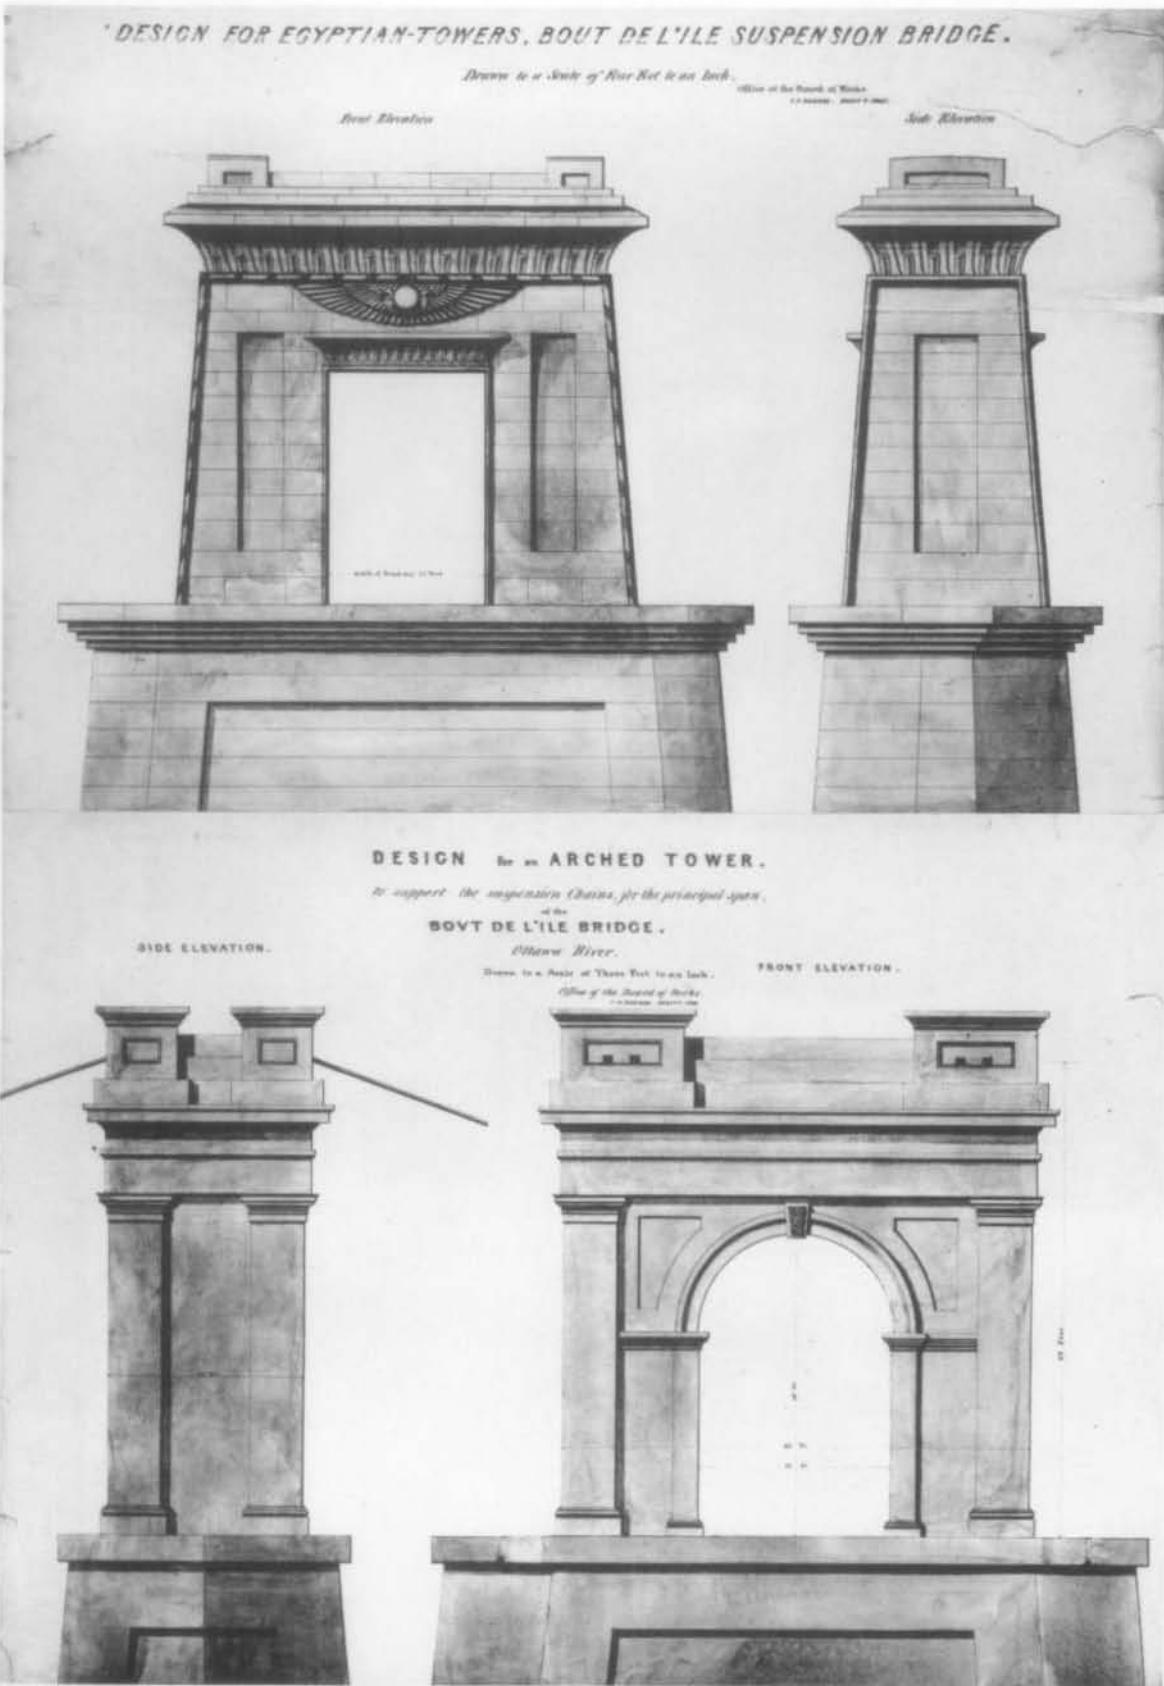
Projects for a suspension bridge at Bout de L'Île, Que. (Photo: Public Archives of Canada).
